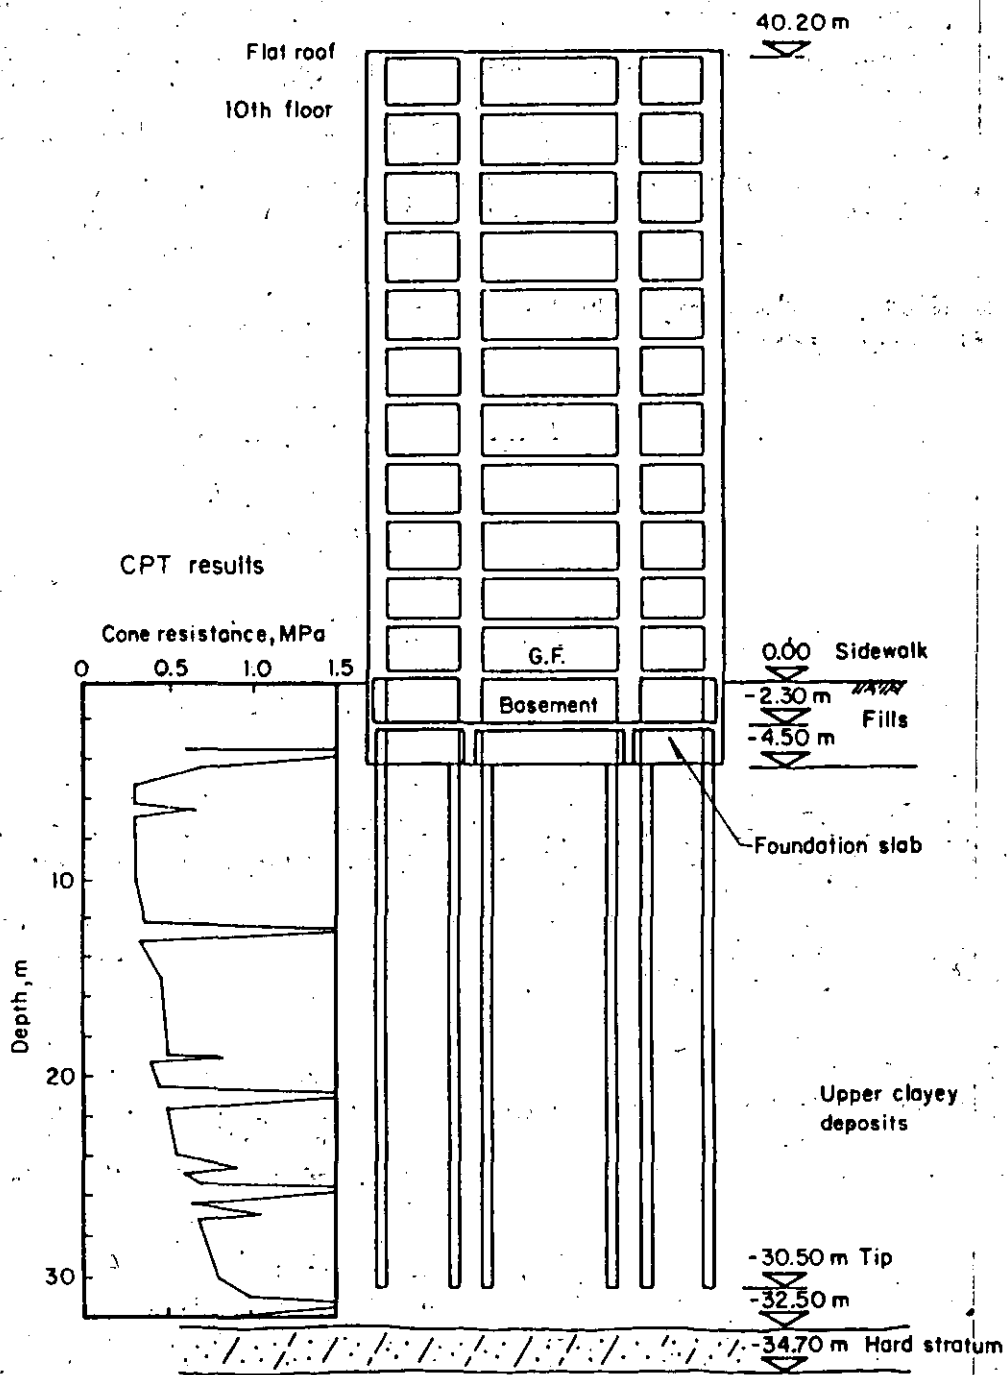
Elevation of the Building IV including foundation and geotechnical conditions.
